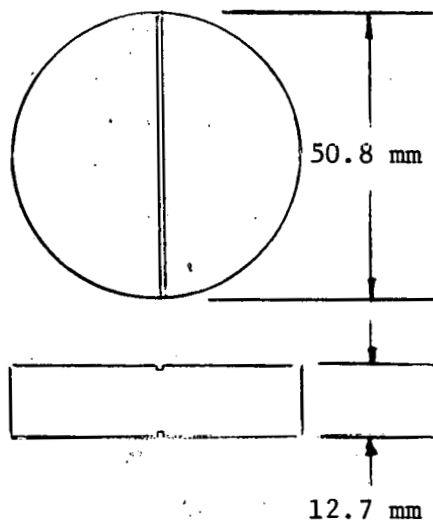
Specimen Configuration Cut From 64 mm Diameter Core.
